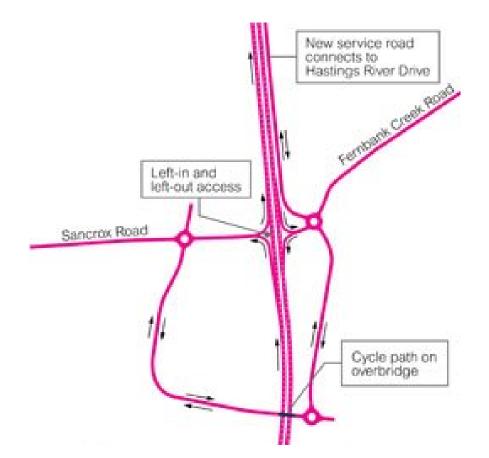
New Service Road (recently constructed and named Winery Drive) connecting
